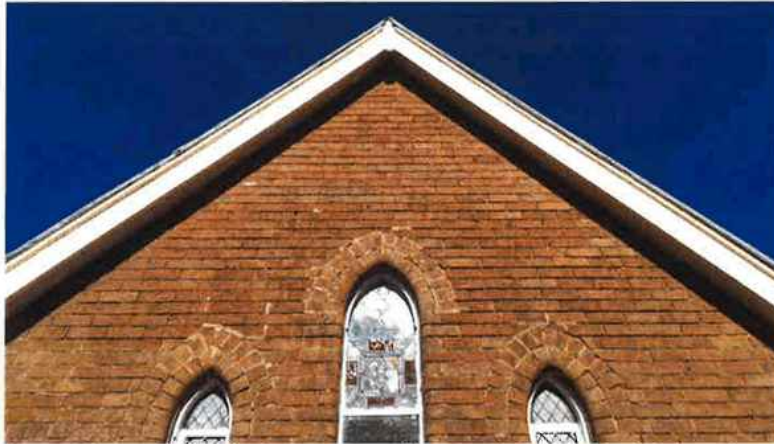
The missing cross and general view of the brickwork and missing pointing. Note the significant windows, leadlight and coloured glass.
